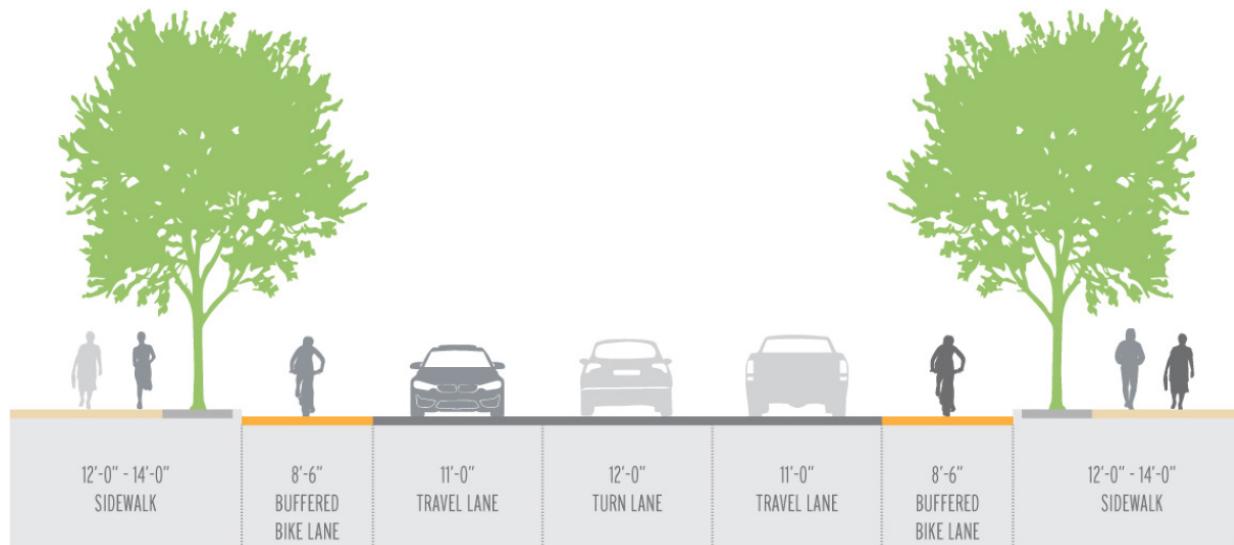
Greenwood Avenue Concept 2: Cross Section A
